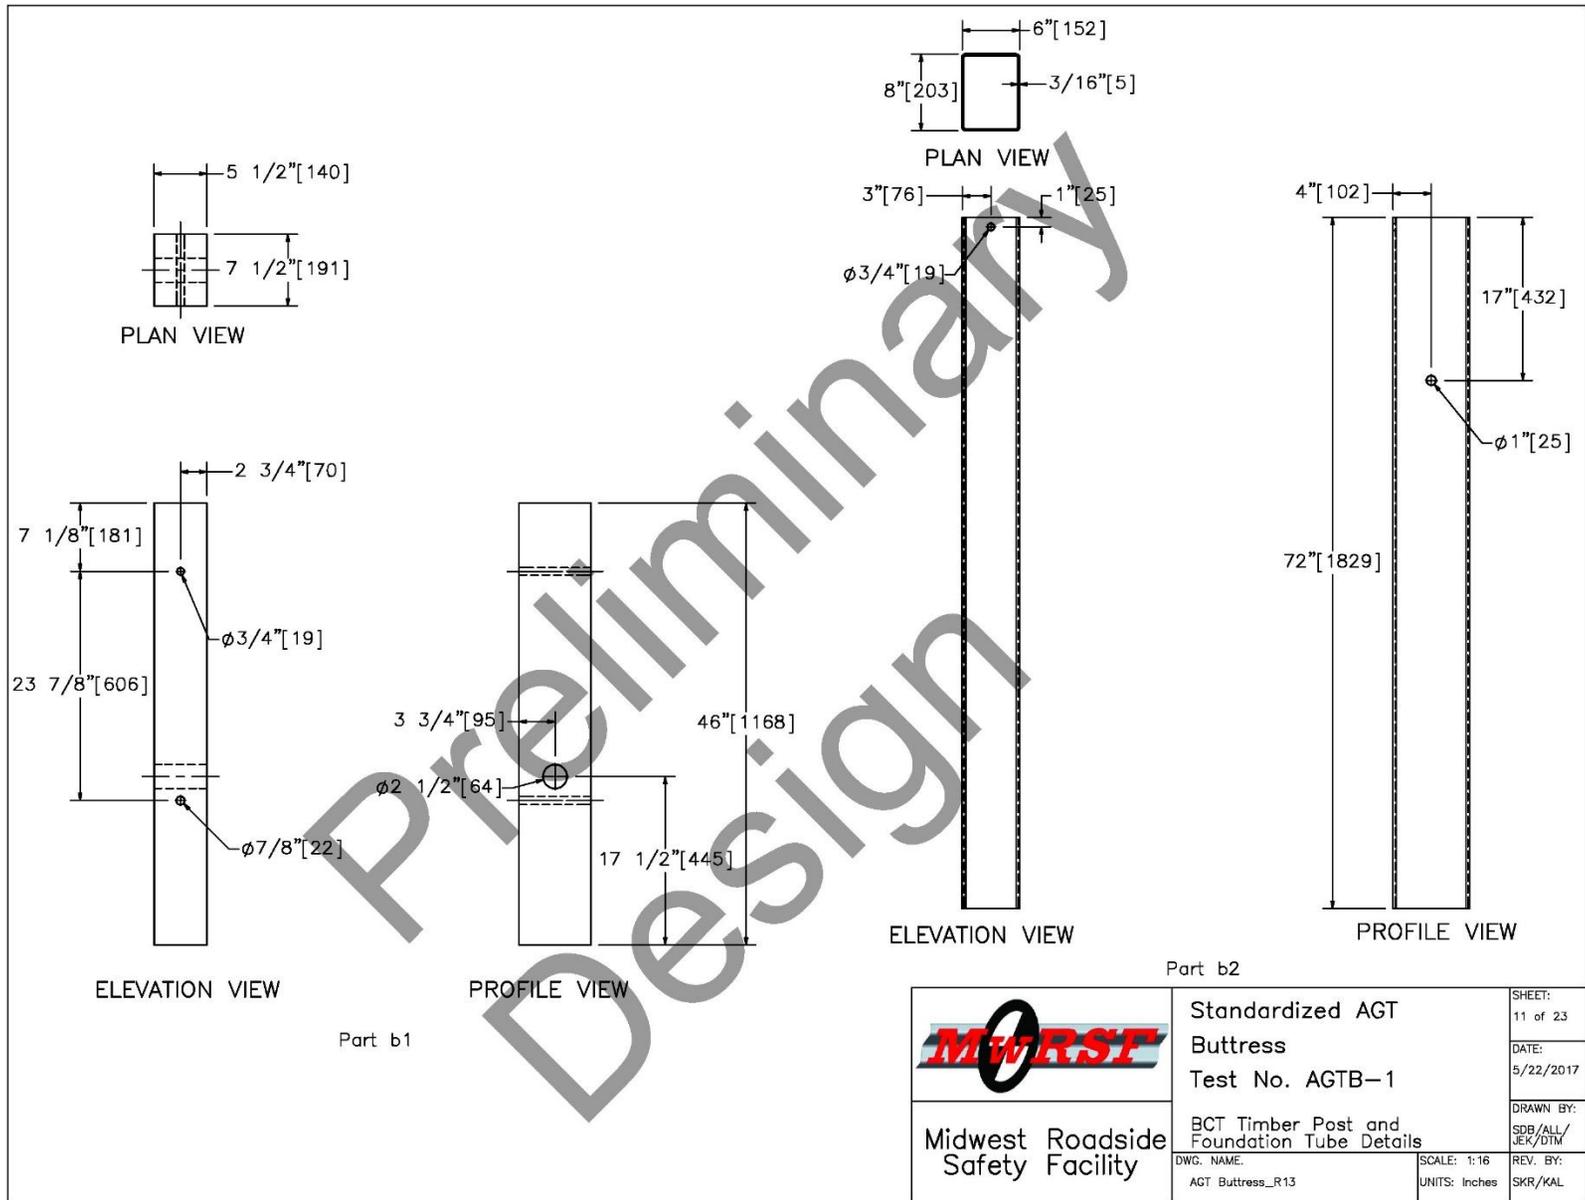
BCT Timber Post and Foundation Tube Details, Test No. AGTB-1
